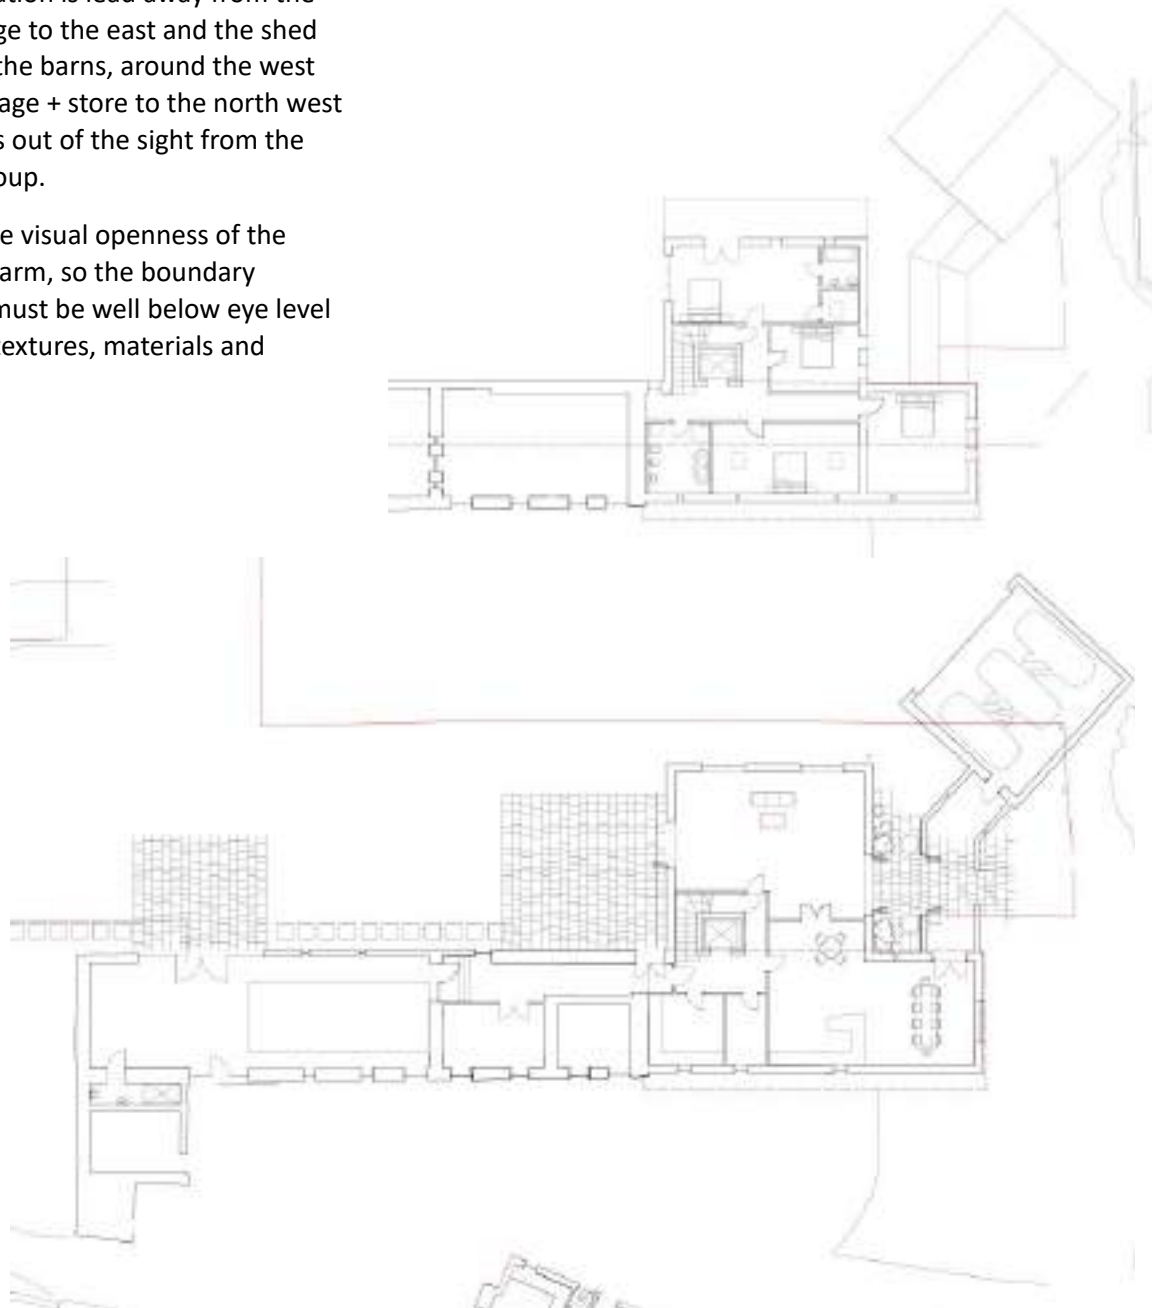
(right top) - Conversion of historic barns (#7 + 8) - proposed layout at first floor
